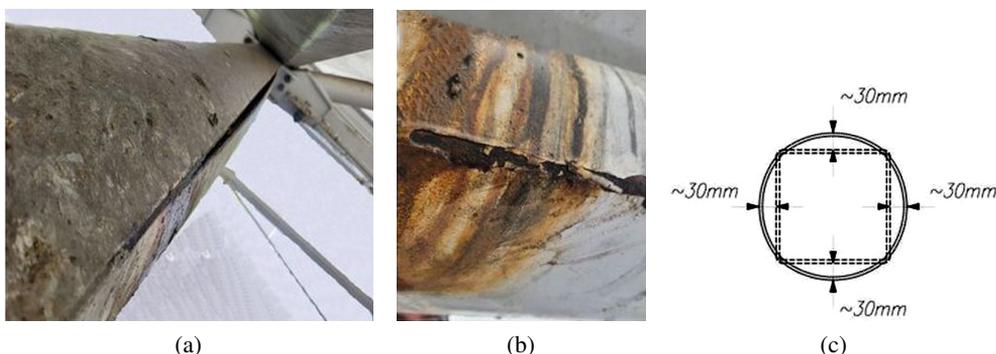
Damage to the second girder caused by deformations: (a) crack along the upper bend edge, (b) paint coating flaking and corrosion on the lower bend edge, (c) inventory of wall deformations
